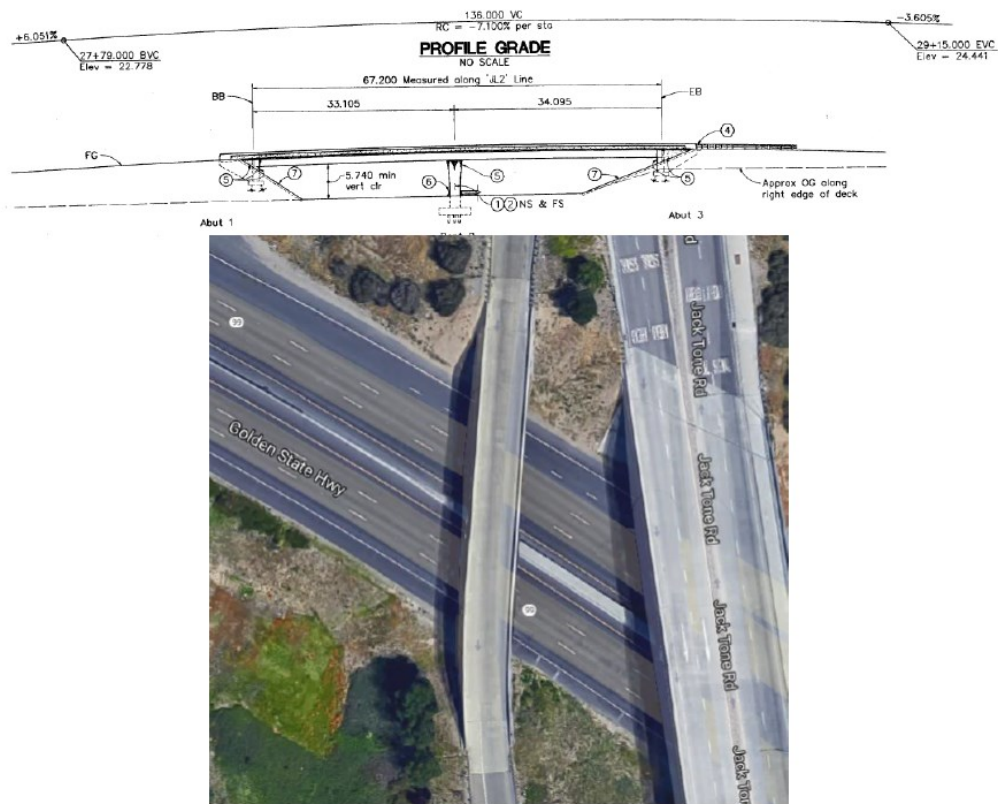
Profile and overview of considered RC bridge (adjacent to main Jack Tone Road) [211]
